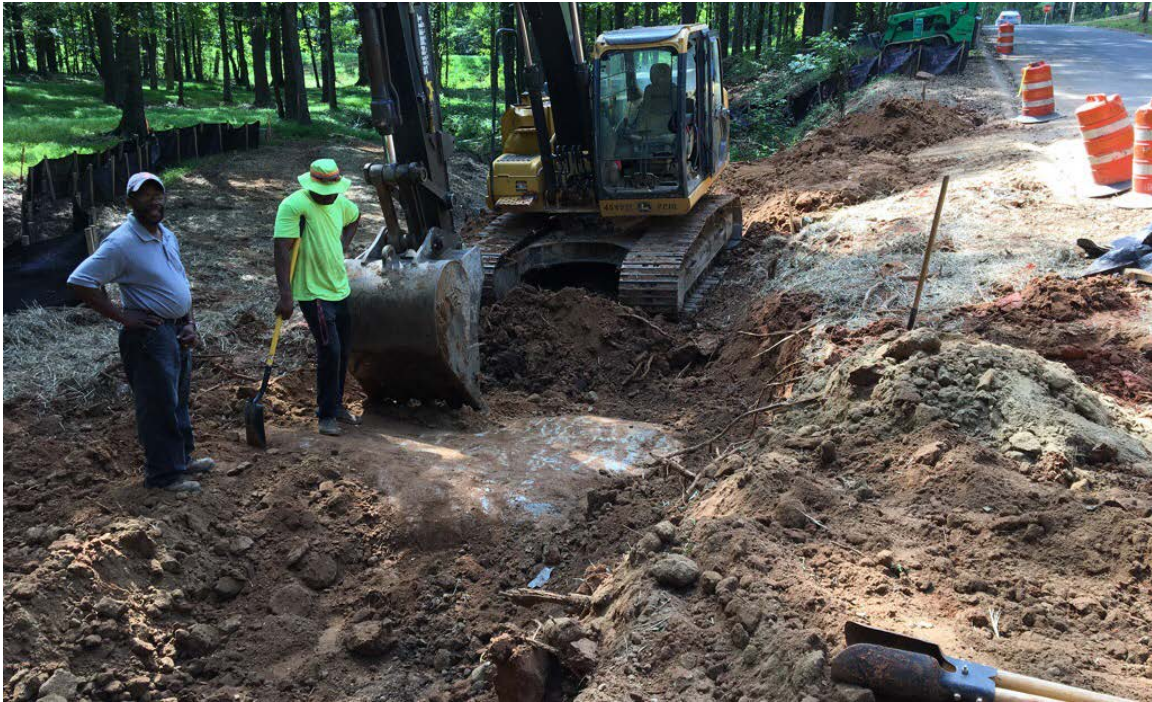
Rock was located during excavation within the area of the proposed waterline and new culvert system. Contractor will examine the area to determine the extent of rock.
